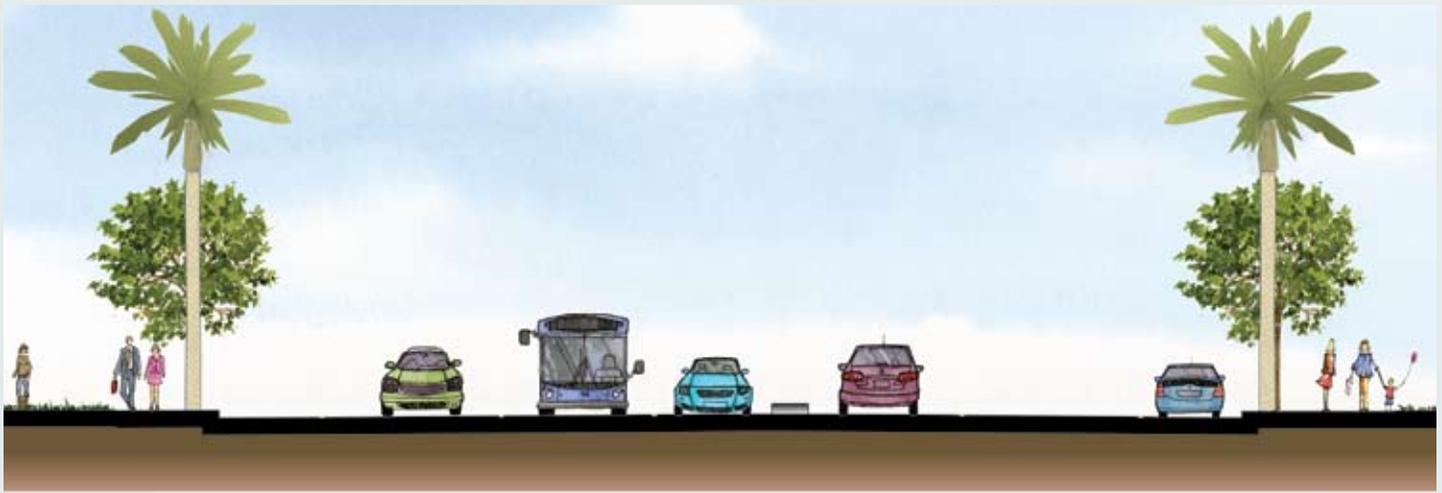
Cross section of Pacific Coast Highway, from Beach Boulevard to 1st Street and from 9th Street to Goldenwest Street
